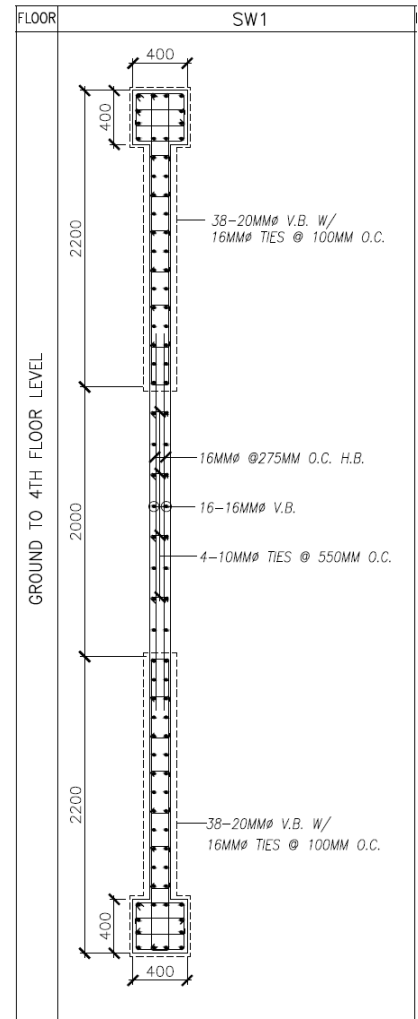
Sections of typical shear wall and adjacent columns of Case P2 (dual system which satisfies loads and story drift limit)
